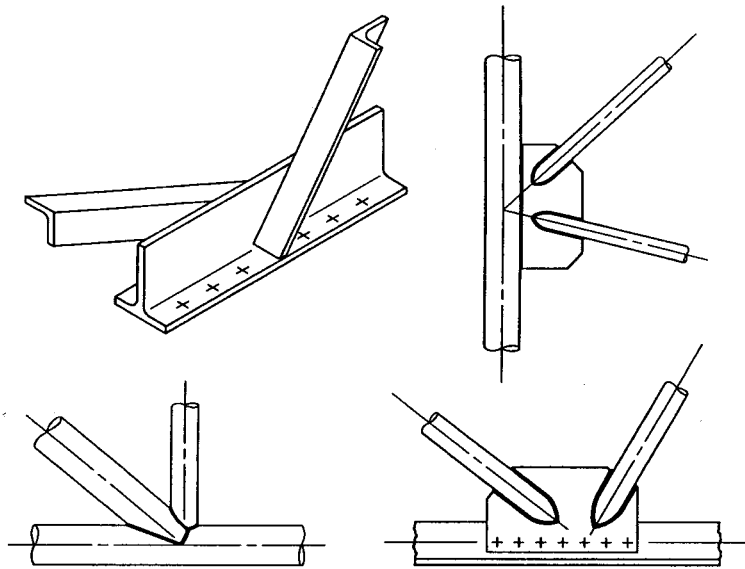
Welding and riveting of members to a common joint of a truss framework.
